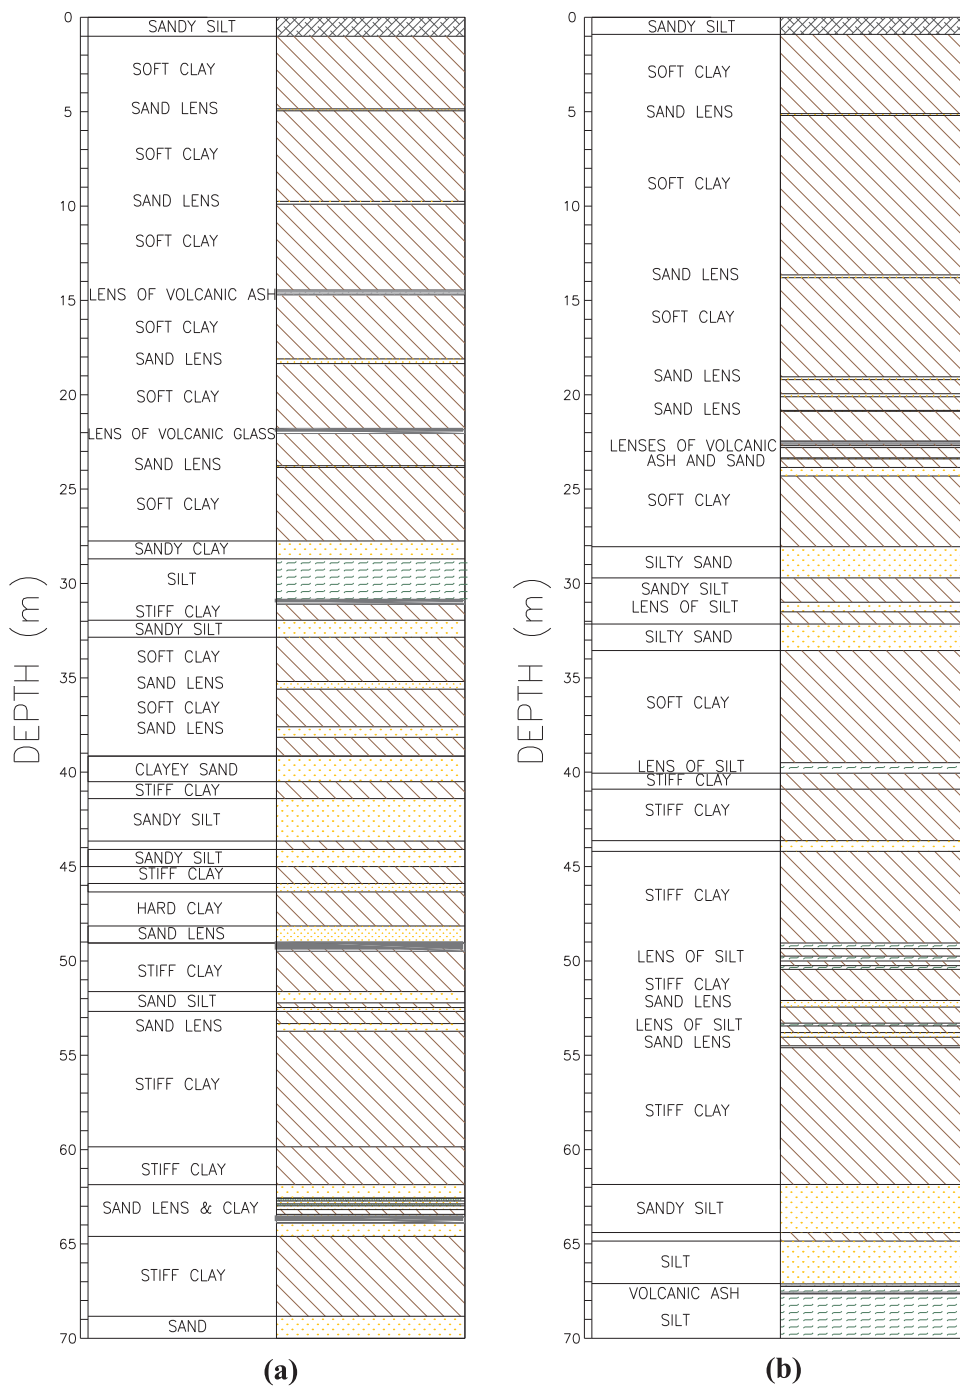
Soil profiles for (a) Site 1 and (b) Site 2.
